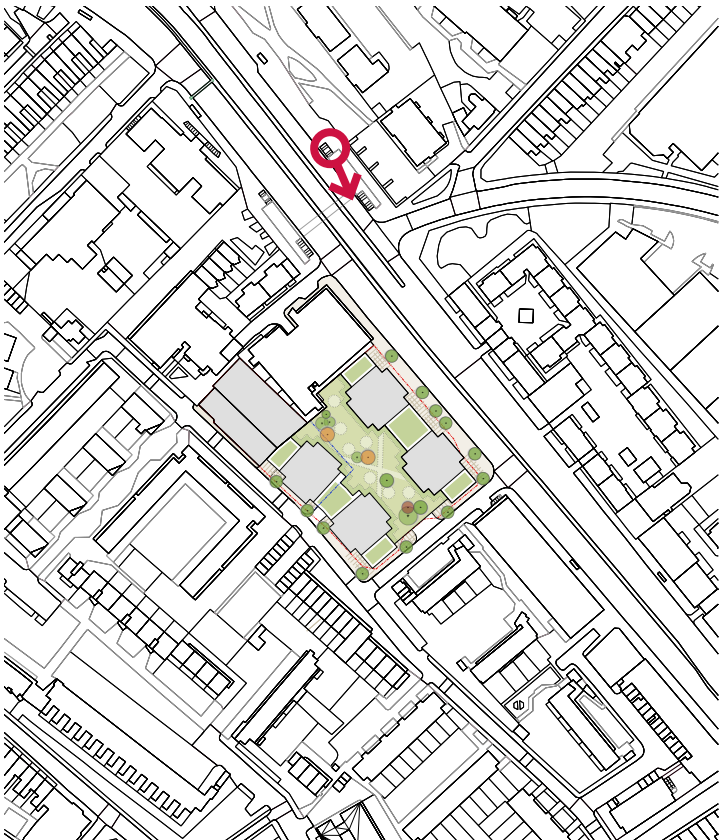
View 03 - Old Kent Road / Mandela Way junction looking south
